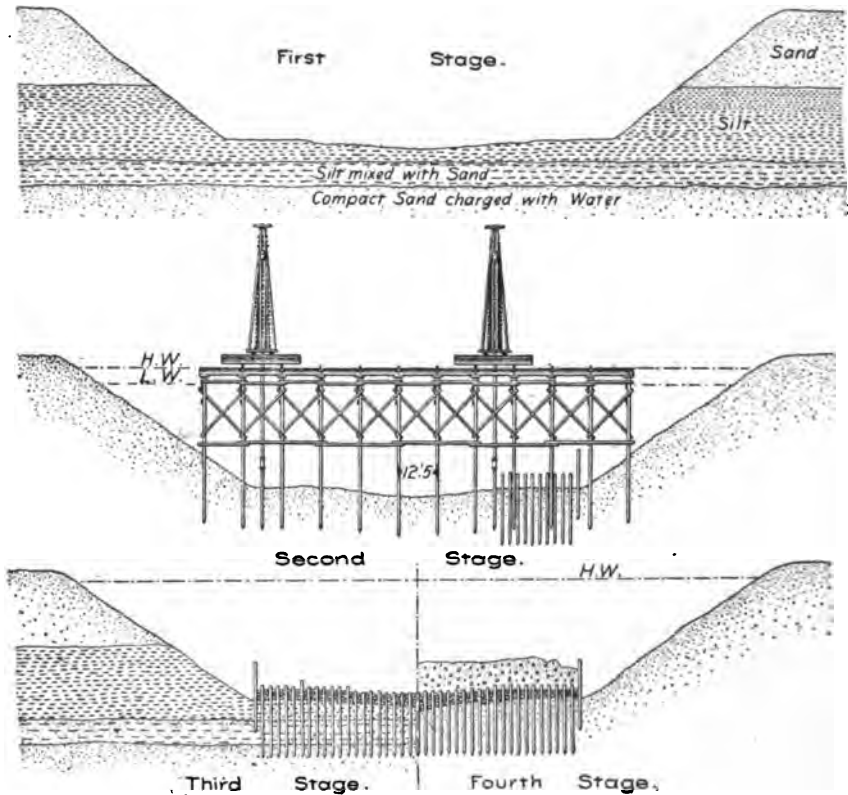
KOBÉ DRY DOCK CONSTRUCTION.
